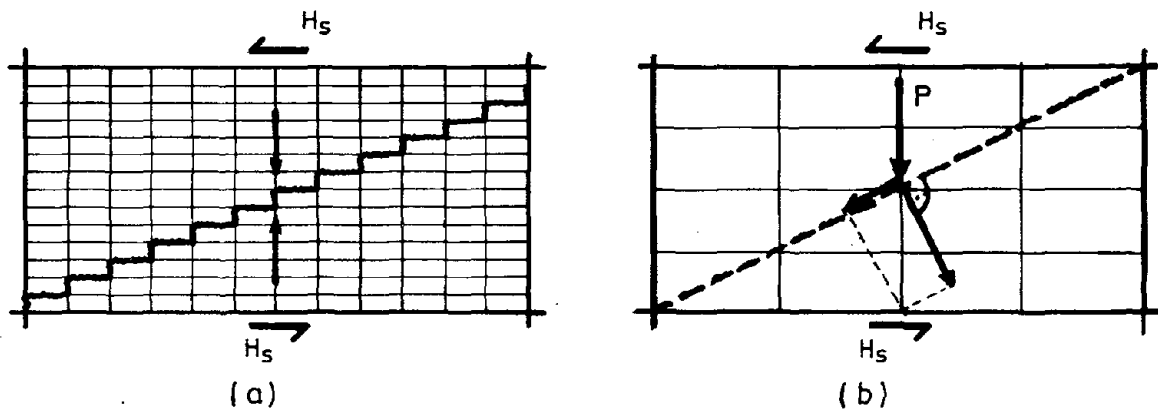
Infill panels with (a) small-sized good-quality bricks or concrete blocks, with cracks in joints (vertical loading transmitted to foundation), and (b) large and/or poor-quality bricks or concrete blocks, with diagonal cracks (vertical loading produces sliding forces).
